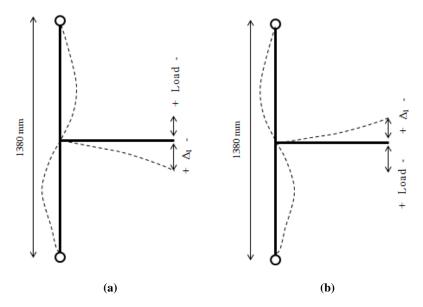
Details of instrumentation positions and predicted deformed shape; (a) down loading, (b) up loading
